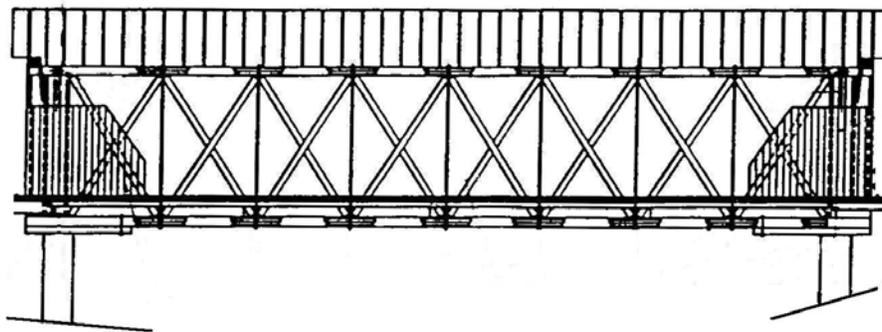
Side view of Hammond Bridge truss system (exterior siding not shown), floor, and rafters. *(Adapted from Shuck-Britson Inc. rehabilitation plans dated January 2003)
